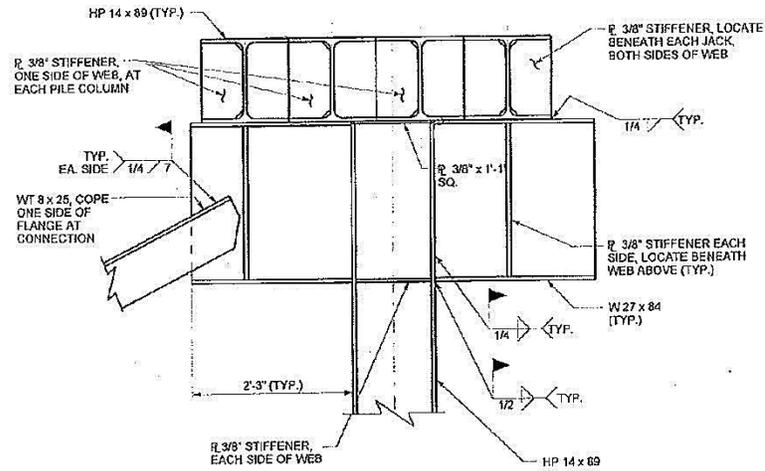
End view of the I-80 over 2300 East temporary substructure for the EB bridge
